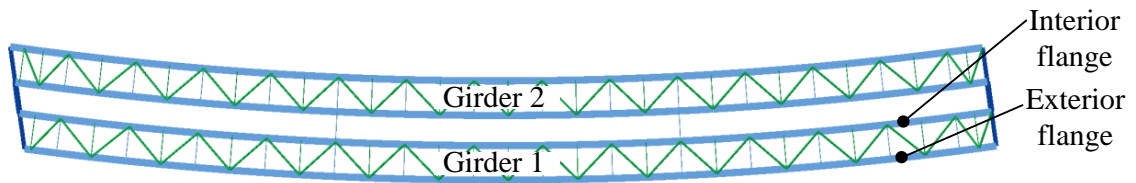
Undesired eccentric top flange lateral bracing detail in NTSSS1 and NTSSS2 bridges.
